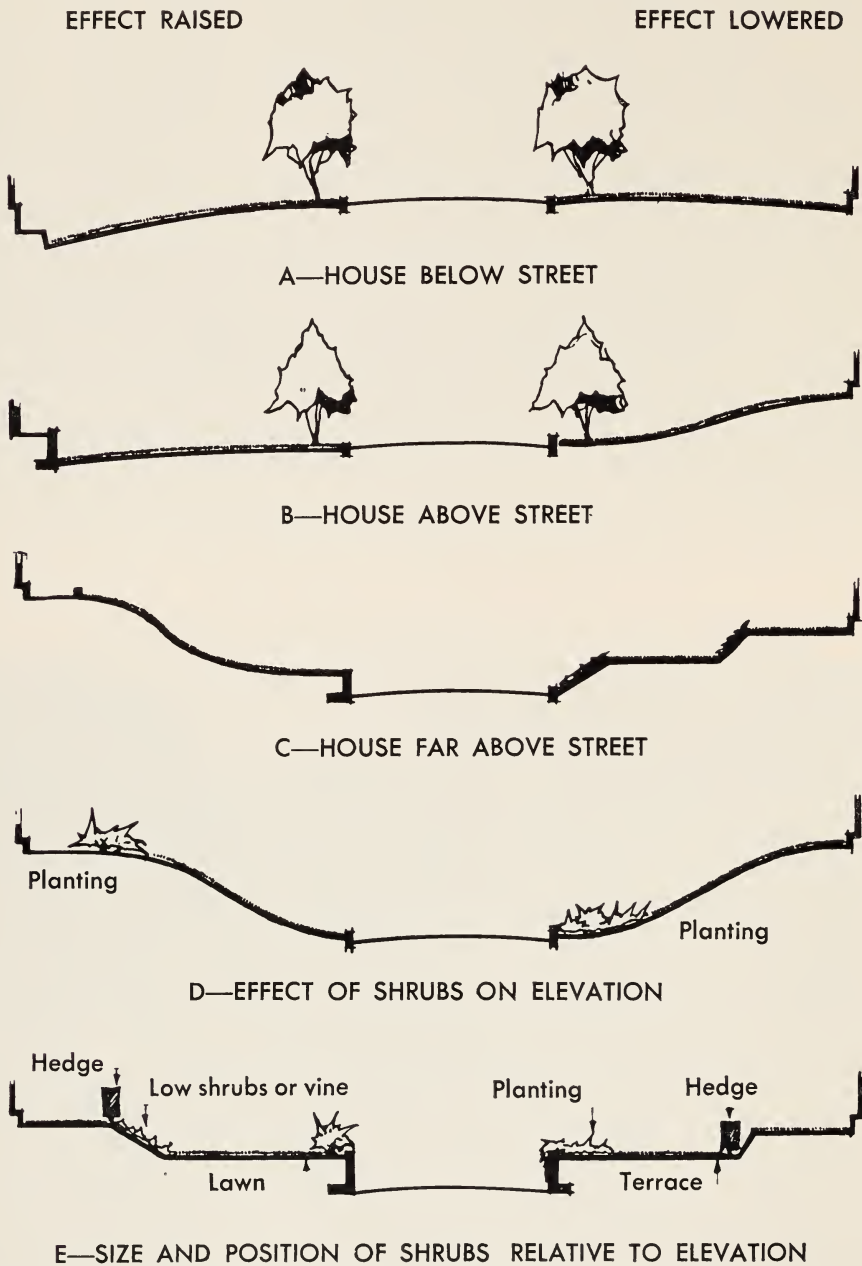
A-E: At left, purpose of planting and grading is to raise apparent height of structure; at right, to lower apparent height. C illustrates position of retaining wall along street to raise apparent height of structure and also to lessen degree of slope. (Drawings by Jack Laffin, Lecturer in Landscape Architecture.)
